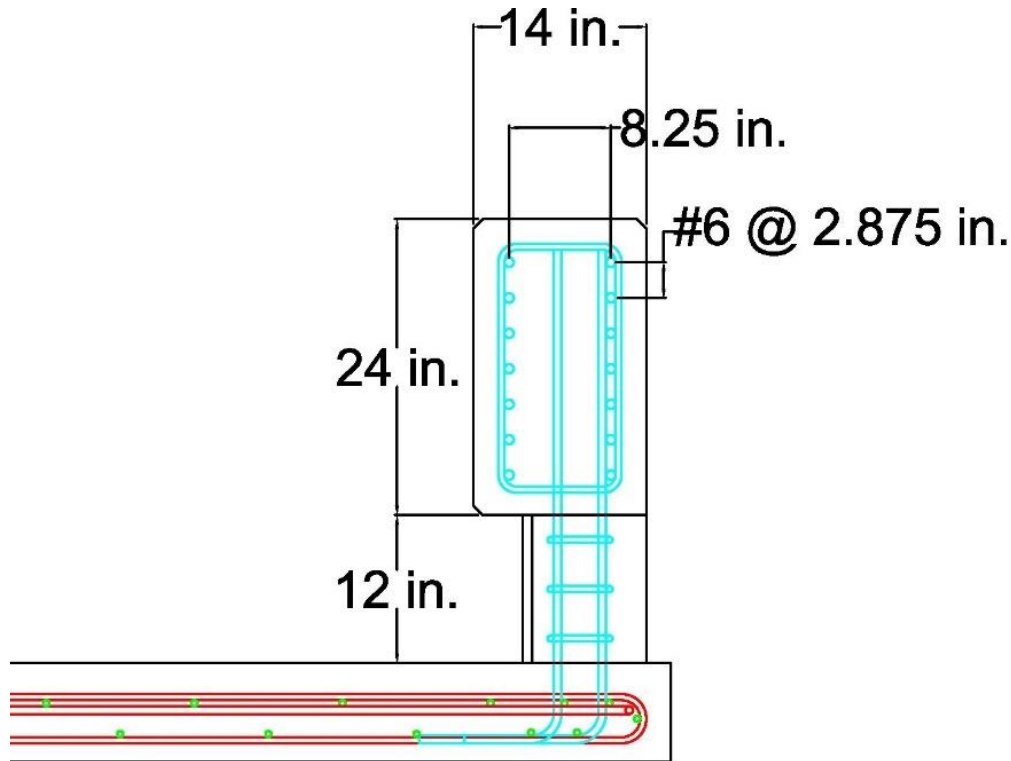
36-in. Open Concrete Bridge Rail End Section, Cross Section
